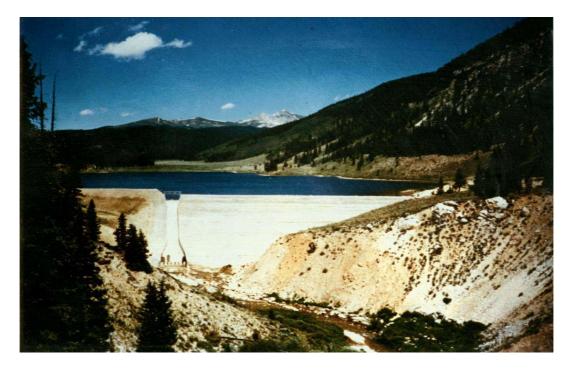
Downstream view of the completed project. Note the raised crest sections at either end, the pre-existing service spillway, the extended outlet conduit (in operation), and the RCC auxiliary spillway liner.
